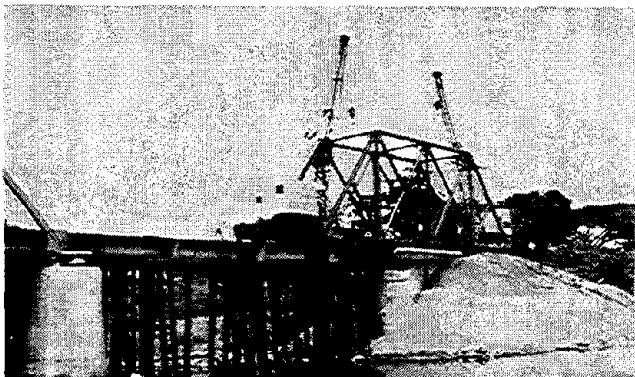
Installation of new trusses Cotaxtla River Bridge.
